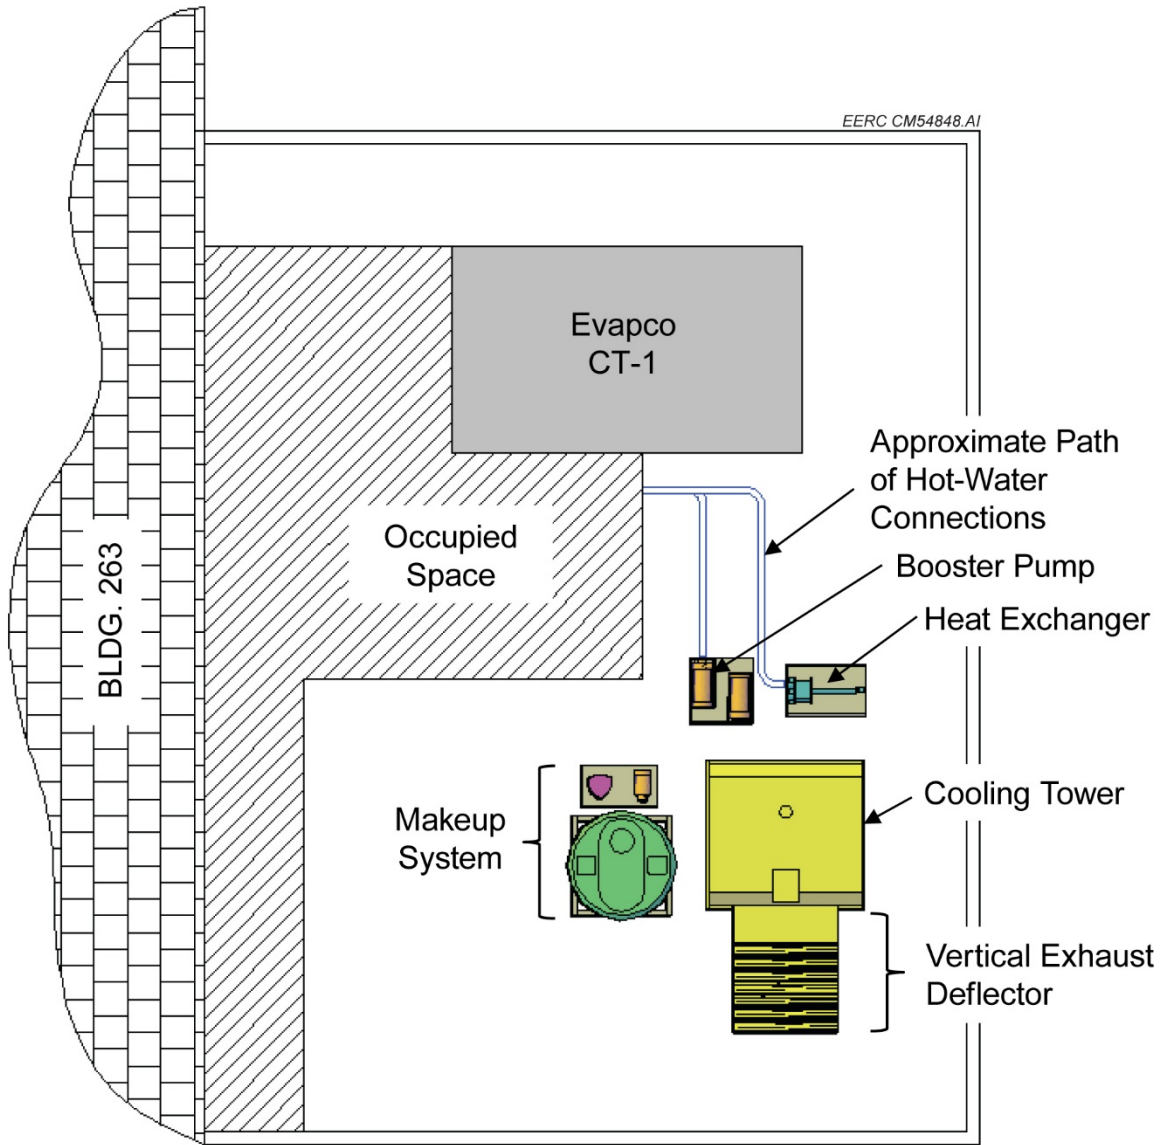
Plan view of Fort Irwin’s Building 263 cooling tower enclosure layout (to be viewed in same orientation as what is shown in Figure 3).
